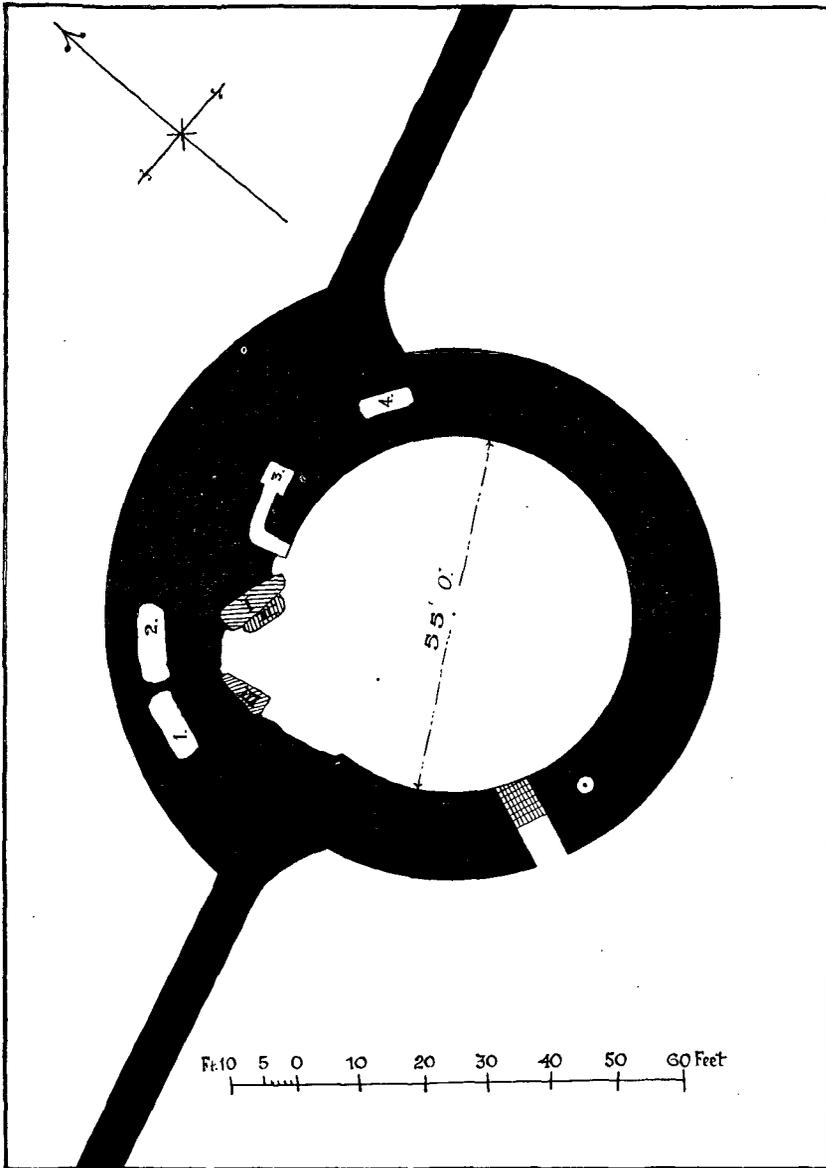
Ground-plan of the Circular Building within the Cashel and abutting on its enclosing wall.
